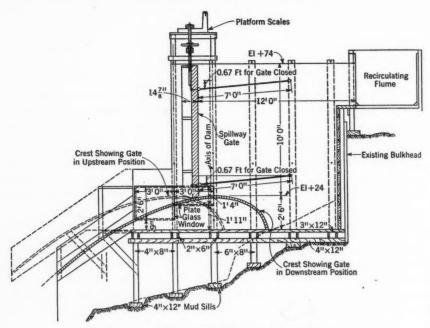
SECTIONAL ELEVATION OF GATE MODEL: SCALE, 1:5
